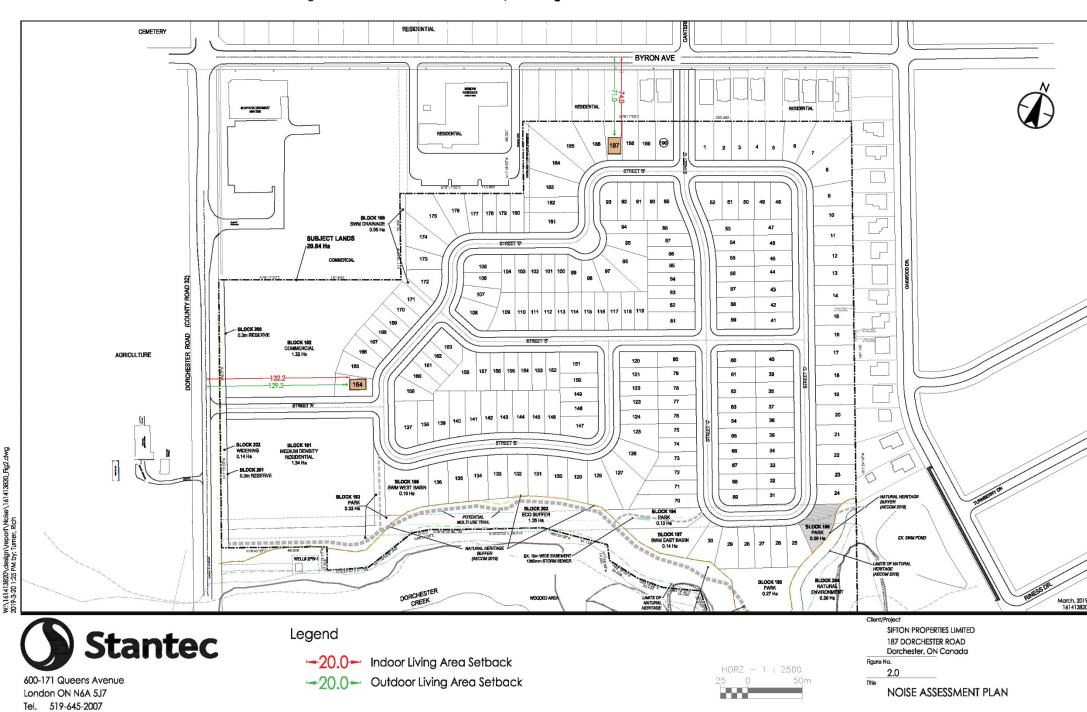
Noise Assessment Plan, Showing the Former Draft Plan Submitted in 2019
